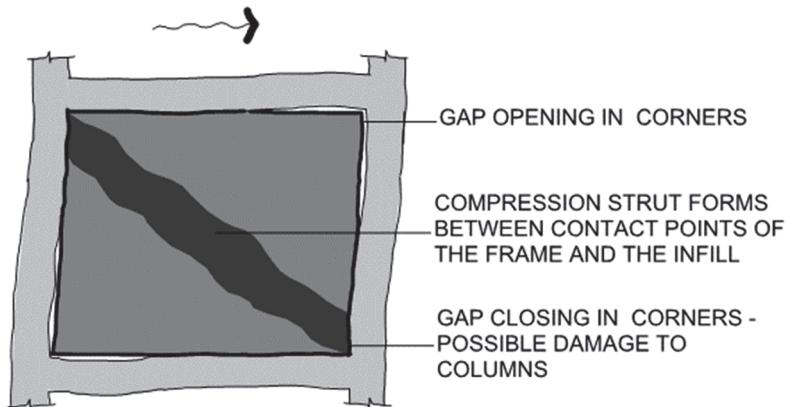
Infill wall subsystem. Note criticality of size of gap.
